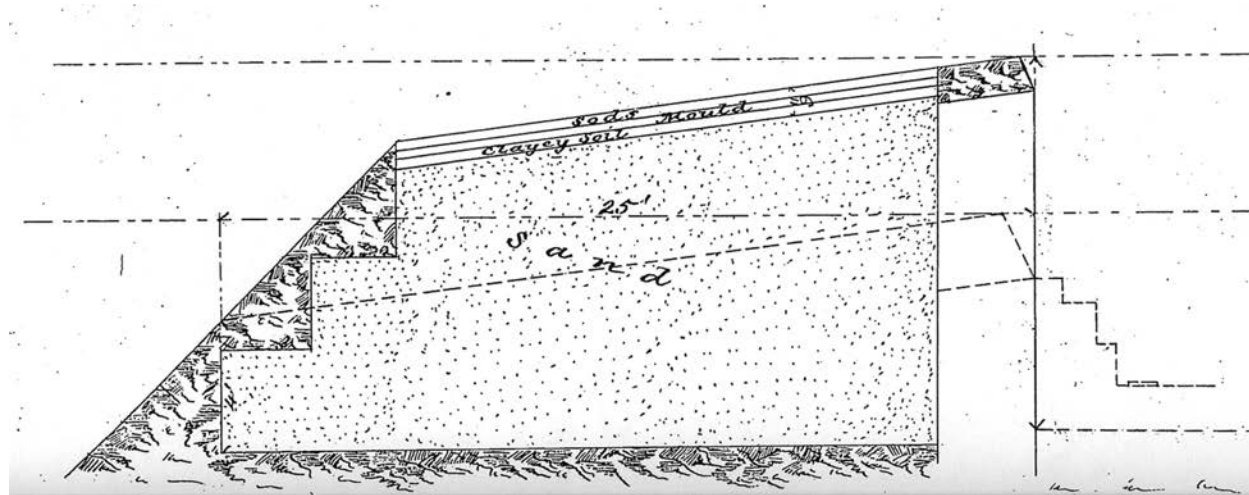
Detail from drawing titled “Cross-section of Parapets Shewing [sic] Their Construction in Sand,” 1871. Note the layers of sod, mould, and clayey soil on the superior slope. *NARA, RG 77, Dr. 155, Sht. 17.
